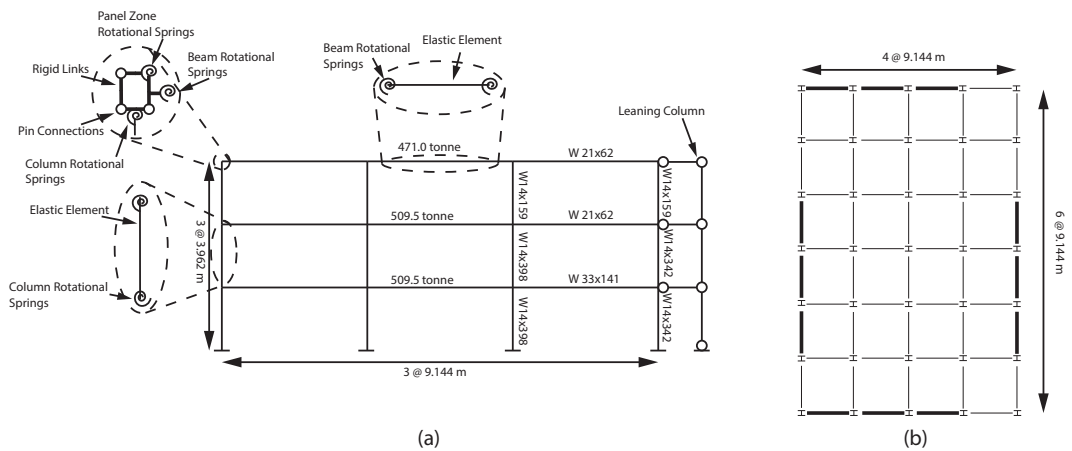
(a) Elevation view and modeling details of seismic force-resisting system of three-story steel office type archetype building, (b) Plan view of archetype building
